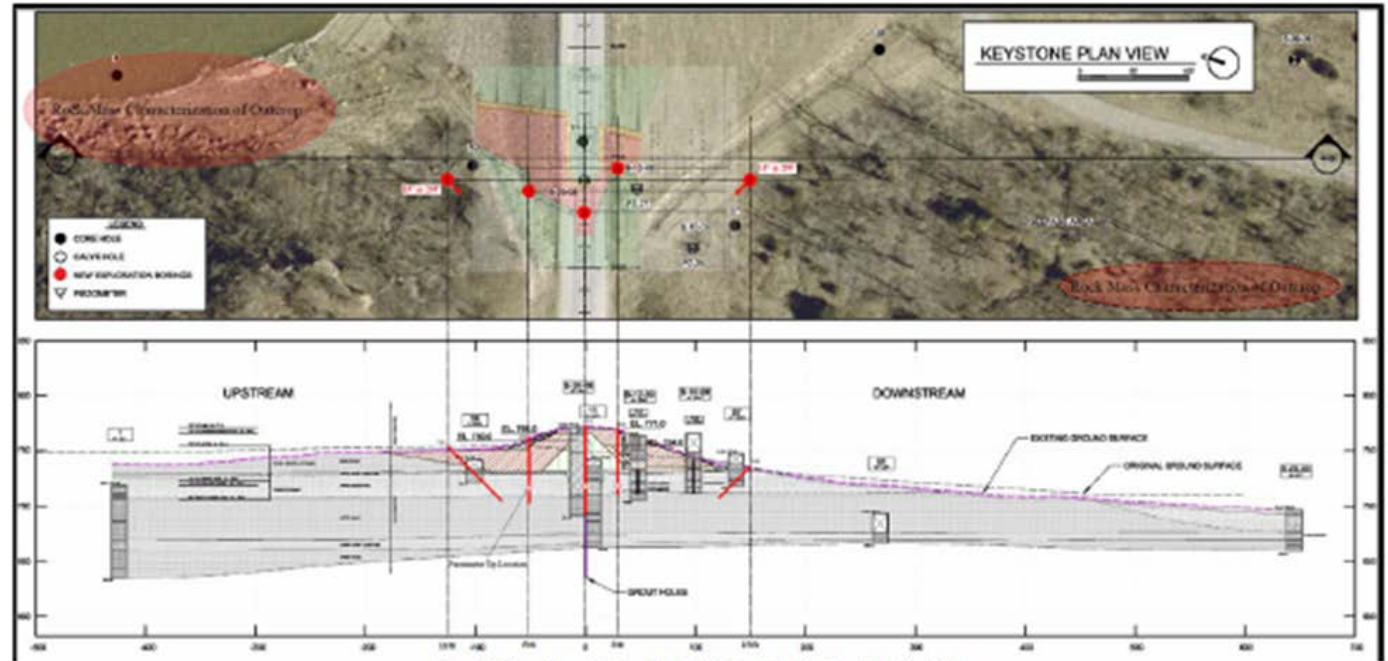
Planned Investigations in Right Abutment (Section through Station 4+00)
